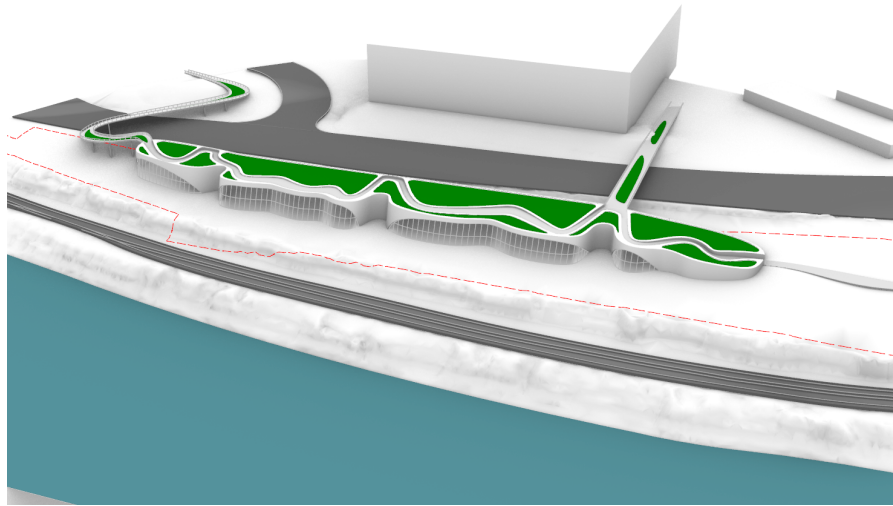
Bird's-eye view of the landform building from the Steel Bridge.
